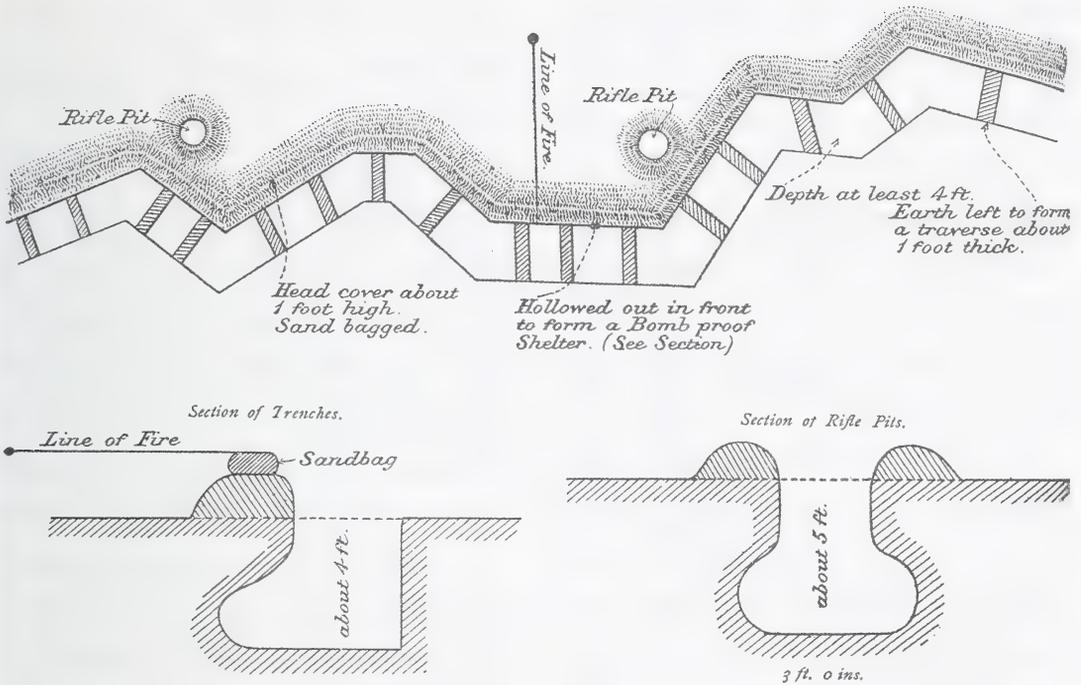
Sketch plan of Boer trenches (after Anon. 1900, 92)
